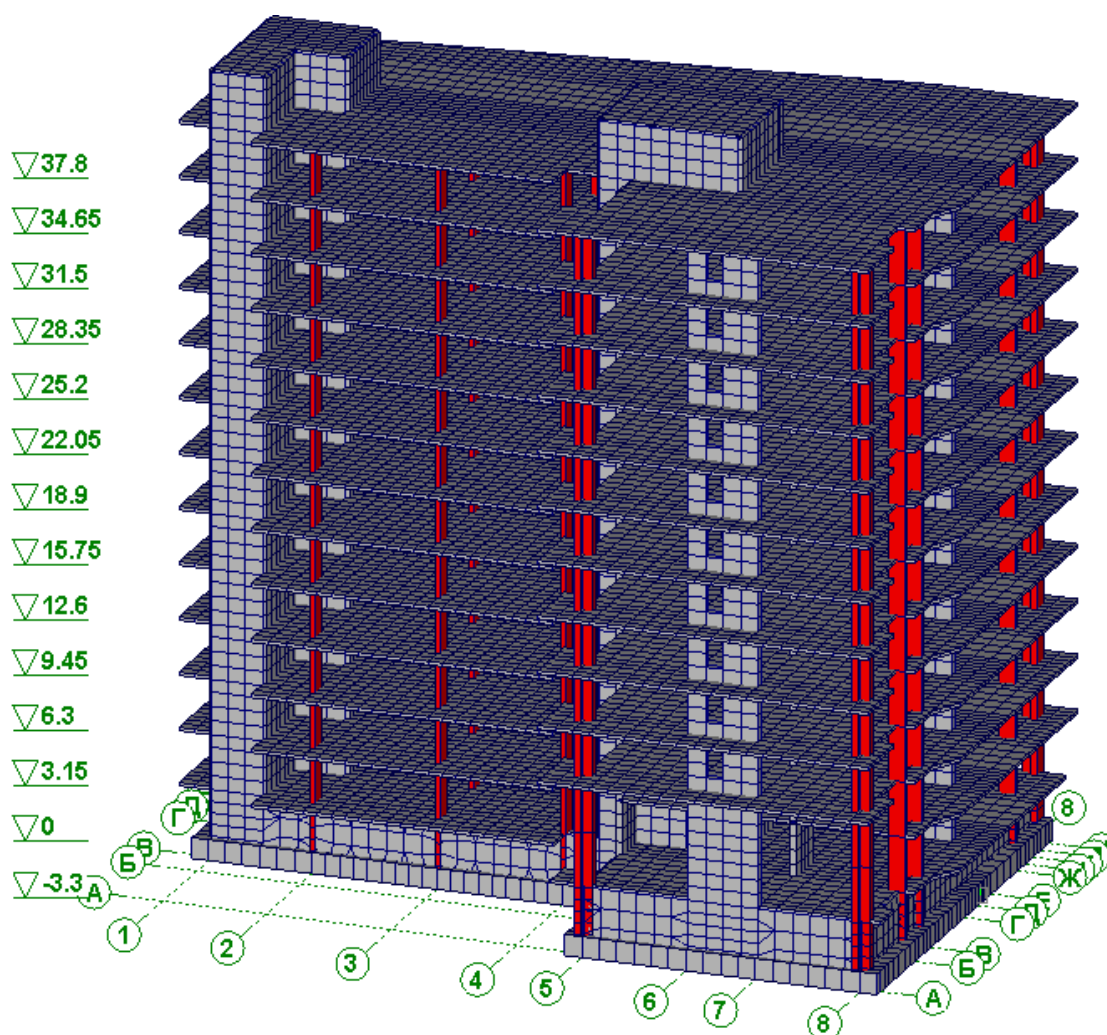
Calculation model of building for seismicity construction site 9 balls
